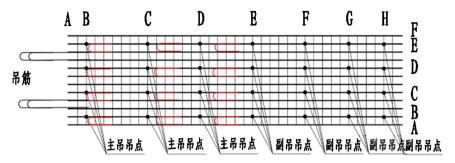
Layout of lifting points of reinforcement cage 图 10. 钢筋笼吊点布置
